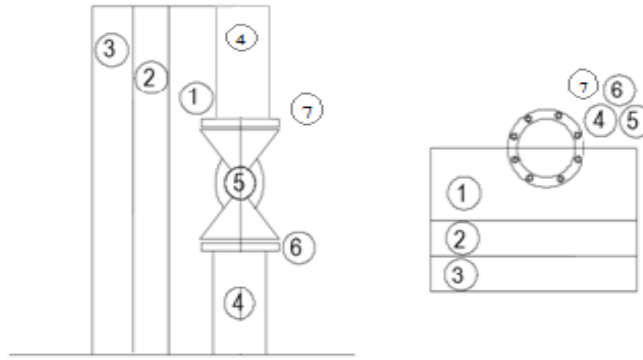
Gas pipeline inlet shut-off device after building insulation works: 1 – Insulation material; 2 – Air gap; 3 – Exterior foundation wall of the building; 4 – Gas pipeline; 5 – Gas line shut-off device; 6 – Gas line threaded connection with shut-off device; 7 – Gas line flange type detachable connection behind the shut-off device.
